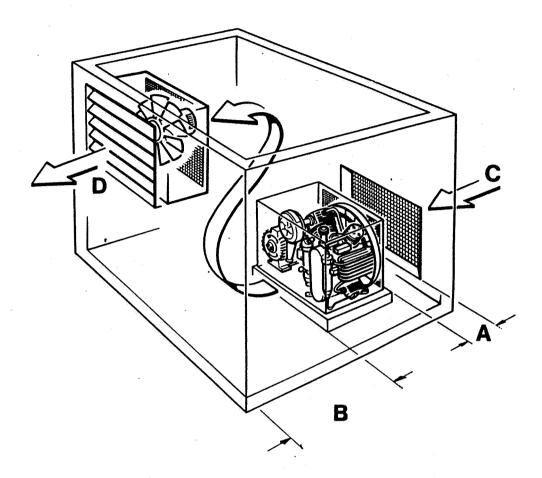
Installation of the compressor unit (forced ventilation) $(room \le 30m^3)$.
